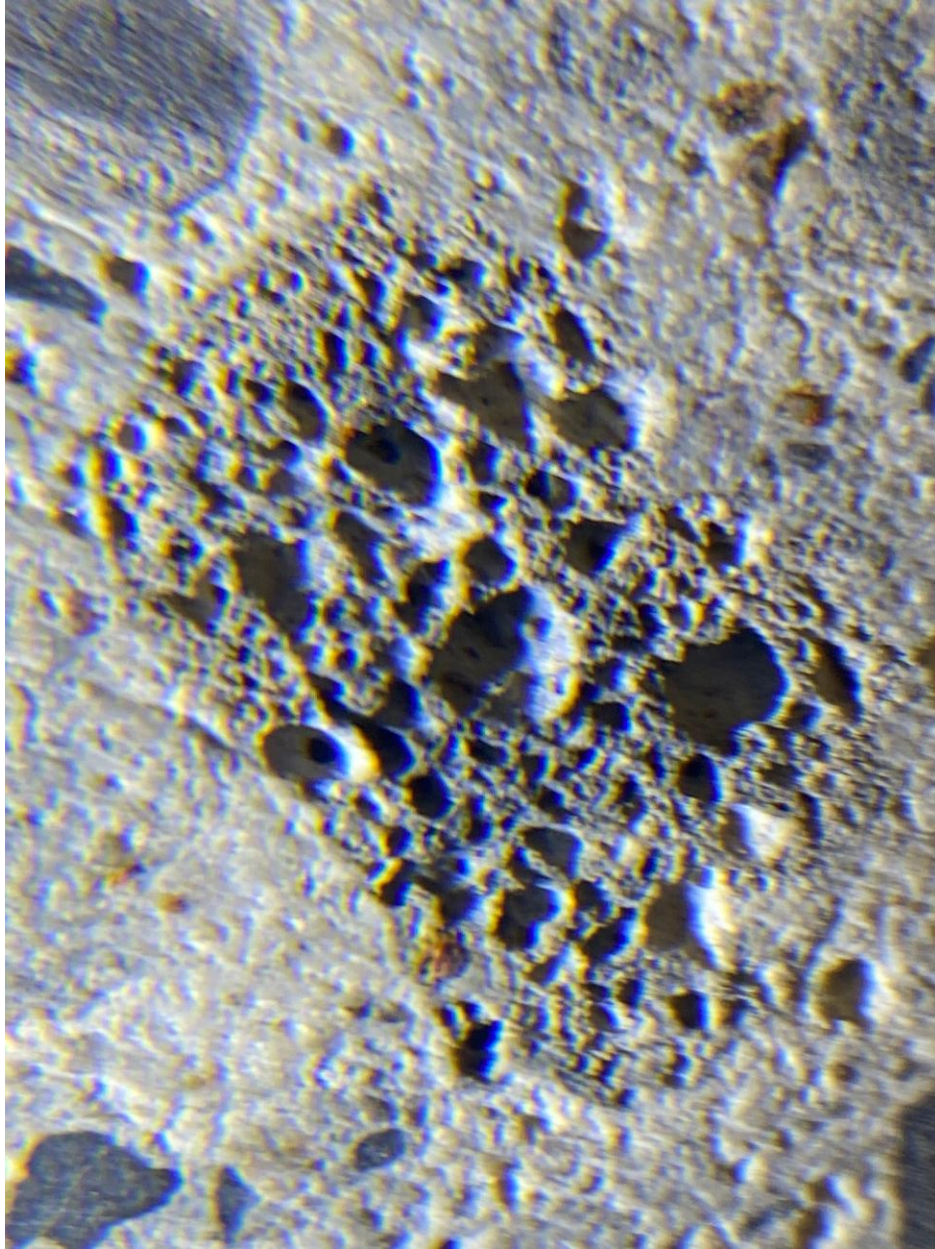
Aggregate in core 5 of lightweight concrete deck at bridge F-792 (3).
